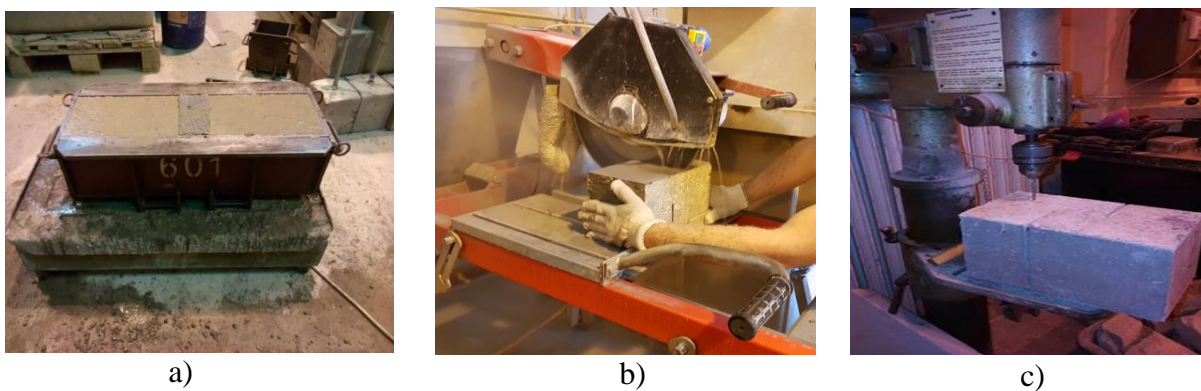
Phases of sample preparations, a) metal mold and table of vibration, b) saw cut-off machine for notches and c) fixed drill-in machine for thermocouples
